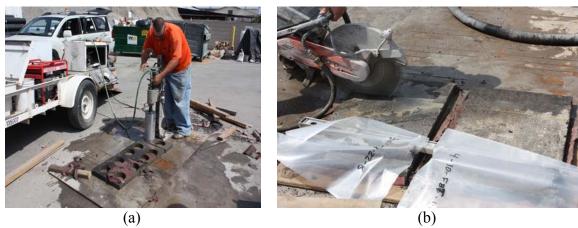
a) Coring SCB specimens and b) Sawing FBT specimens.
